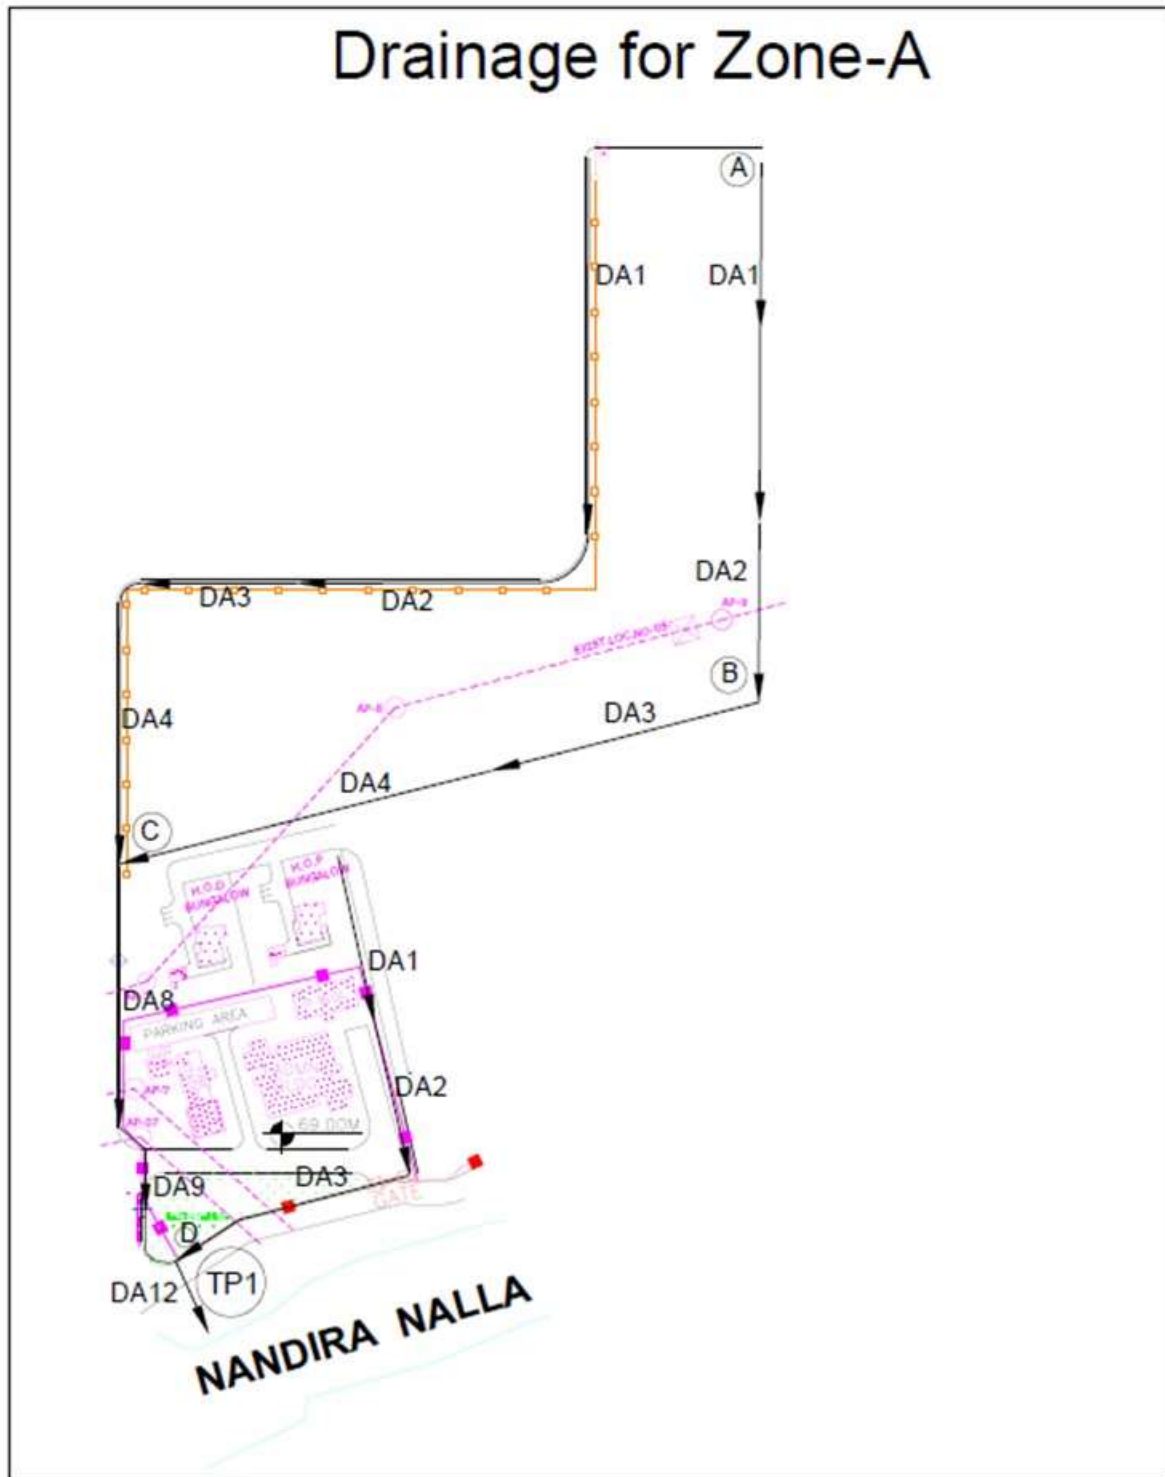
A Zone drainage plan showing drains, longest flow path and outfall location
